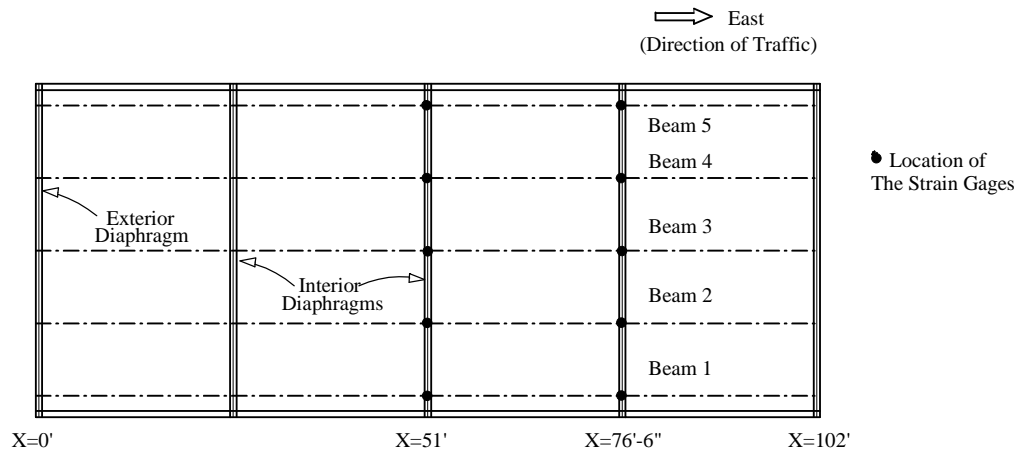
Instrumentation Layout Used in Test Series 3, Nolanville Bridge
